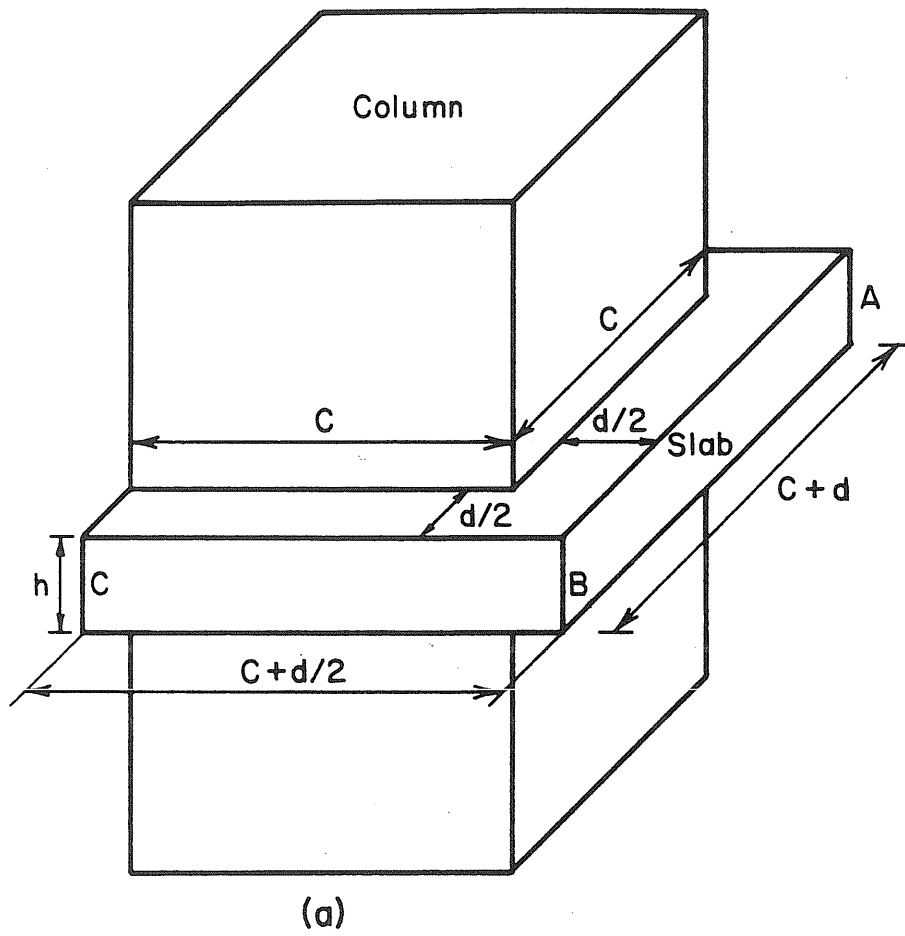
Critical Section and Actions at Exterior Slab-Column Connection
